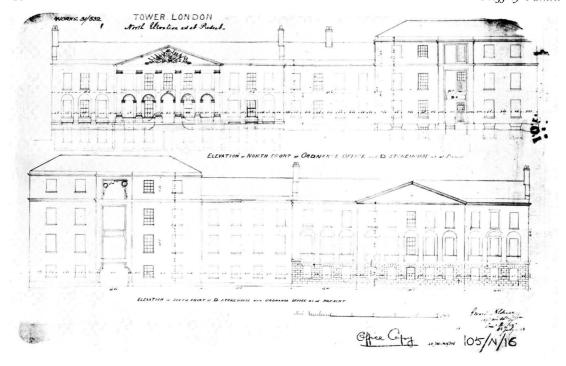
North and south elevations of Ordnance office and stores drawn in 1853.
